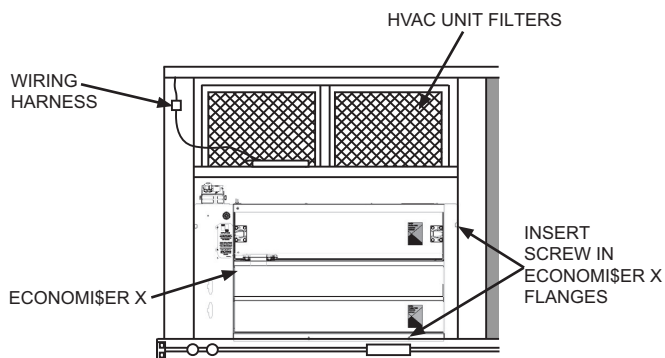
EconoMiSer® X Assembly Installed on HVAC Unit (CRECOMZR067A01 Shown)
